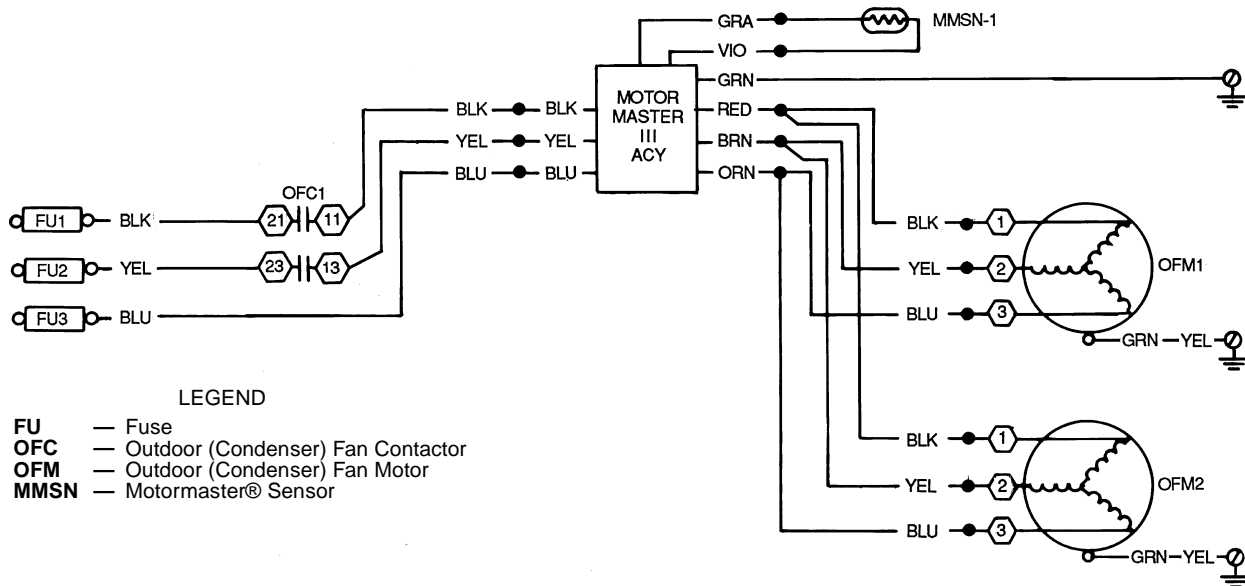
Motormaster III Control Wiring — 208/230-3-60 Units
